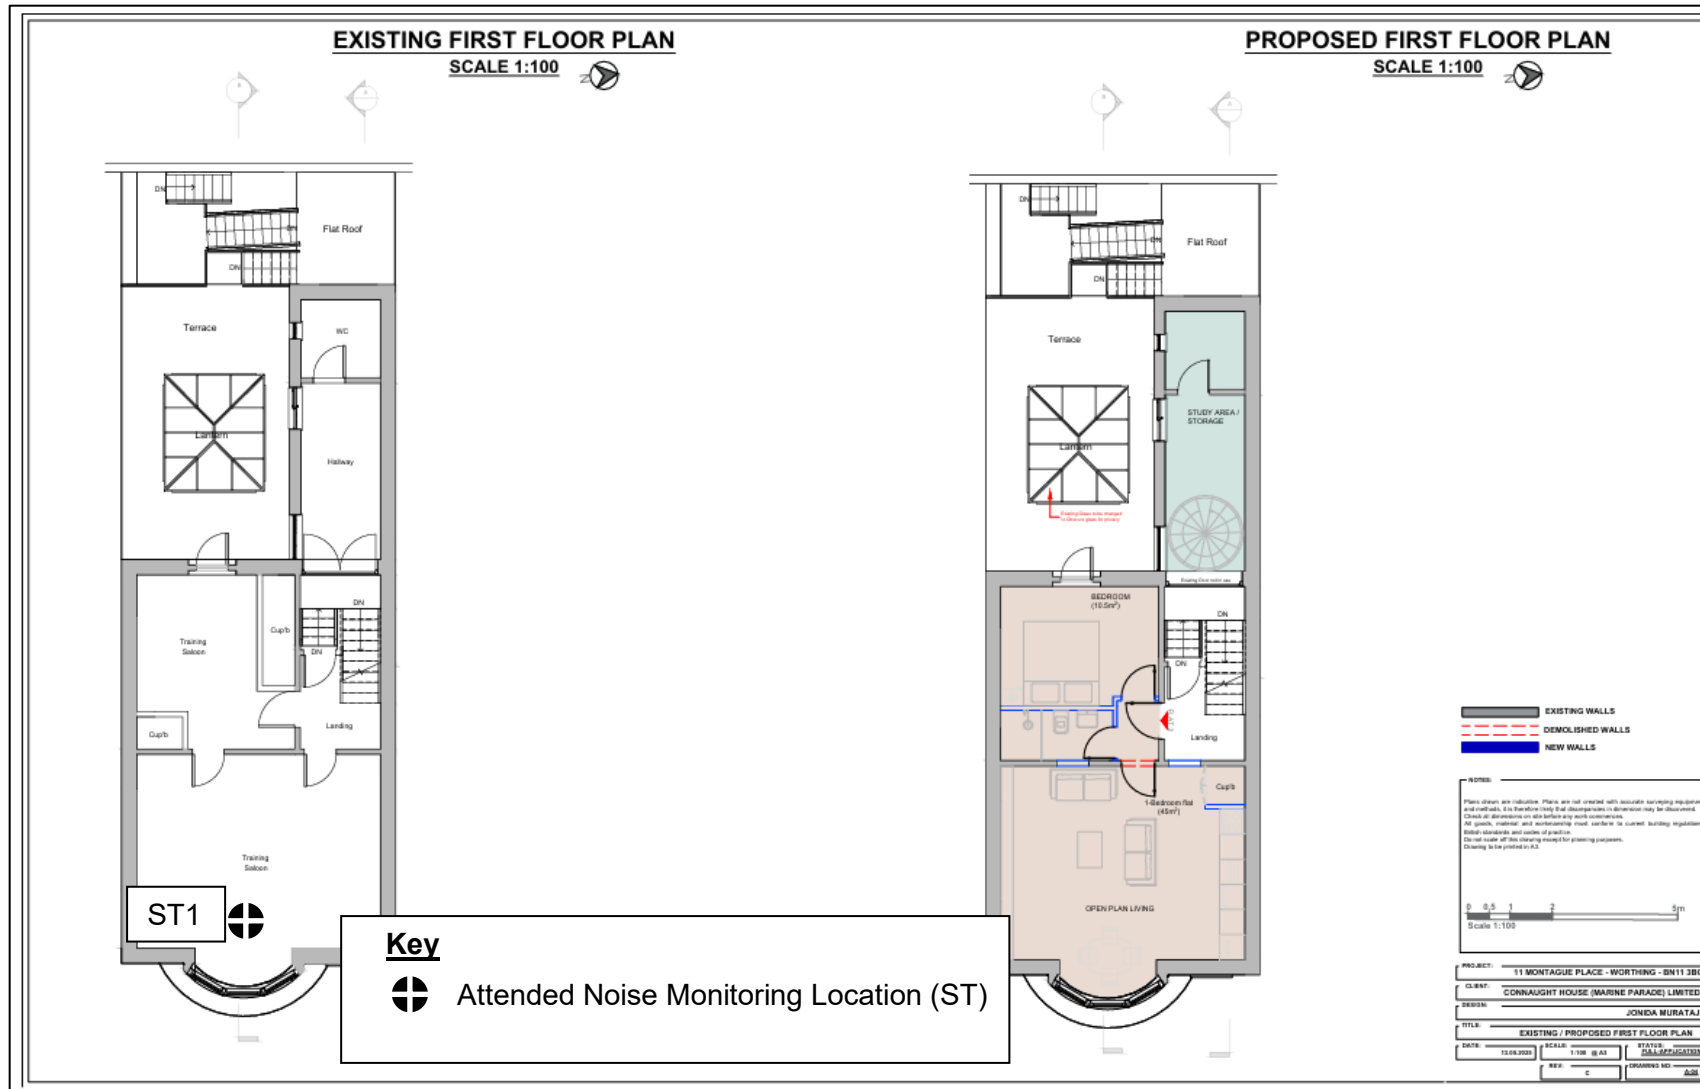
Existing and Proposed Site Floor Plans – First Floor
